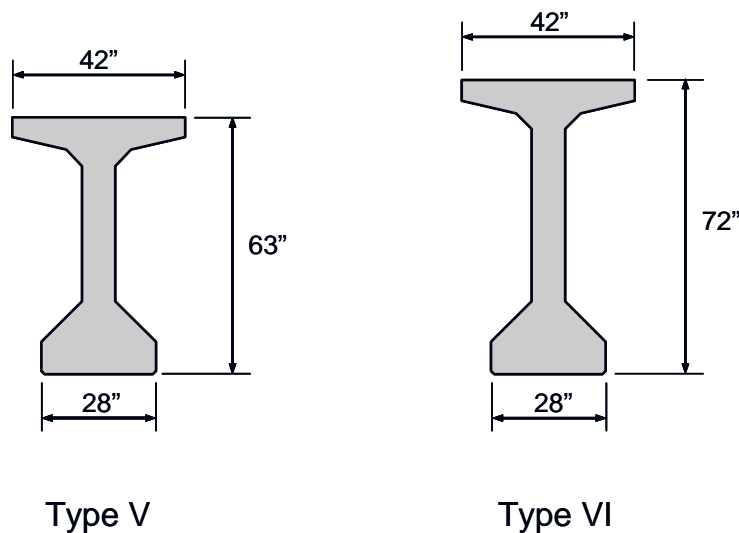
Larger AASHTO I-Girder Sections for Prestressed Bridges
